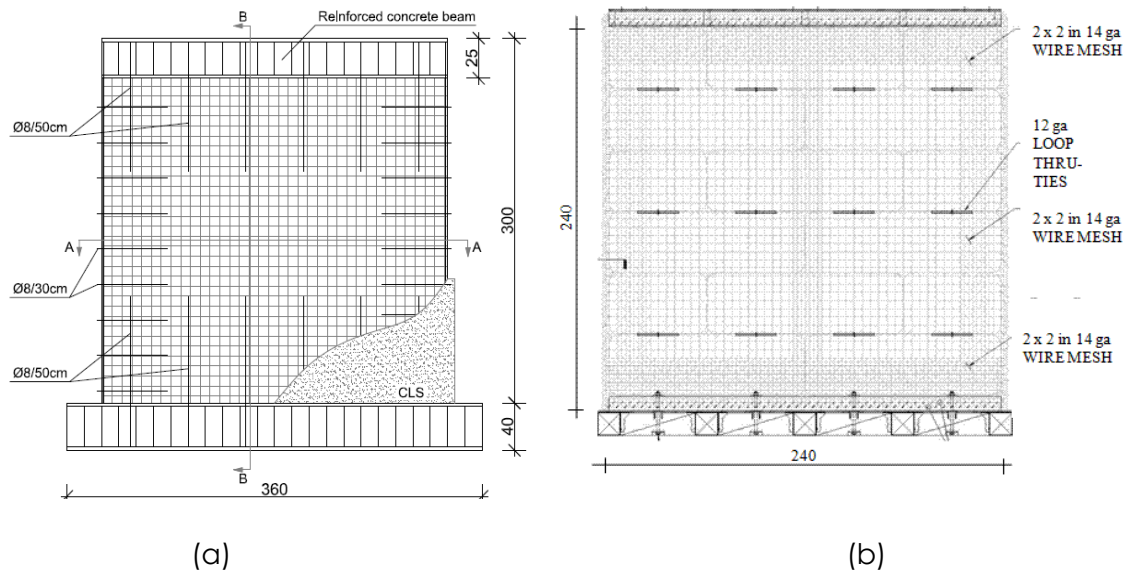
Drawing plan of the specimens: (a) Nydion panel; (b) Straw bale wall.
